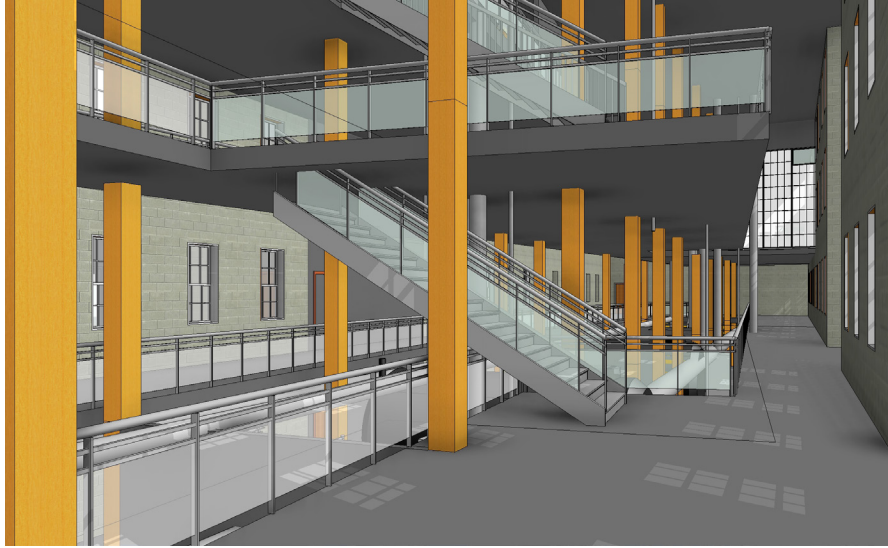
Image shows connection of second floor to first floor, looking down towards lecture space as well as the mixed double and single heights. Graphic by author
